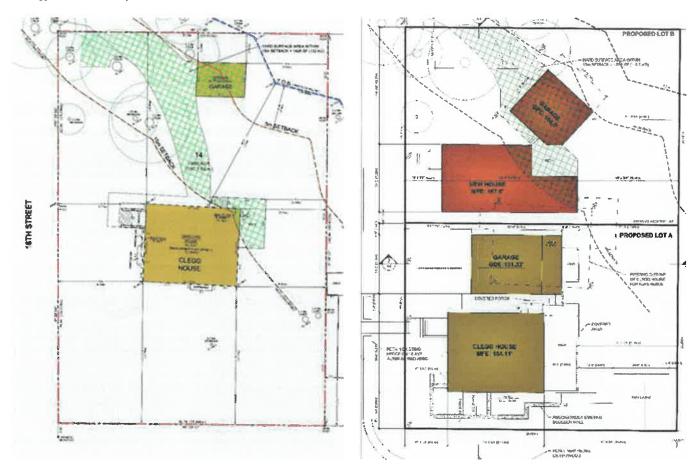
Existing Site Plan \_ Focus Architectural Inc
